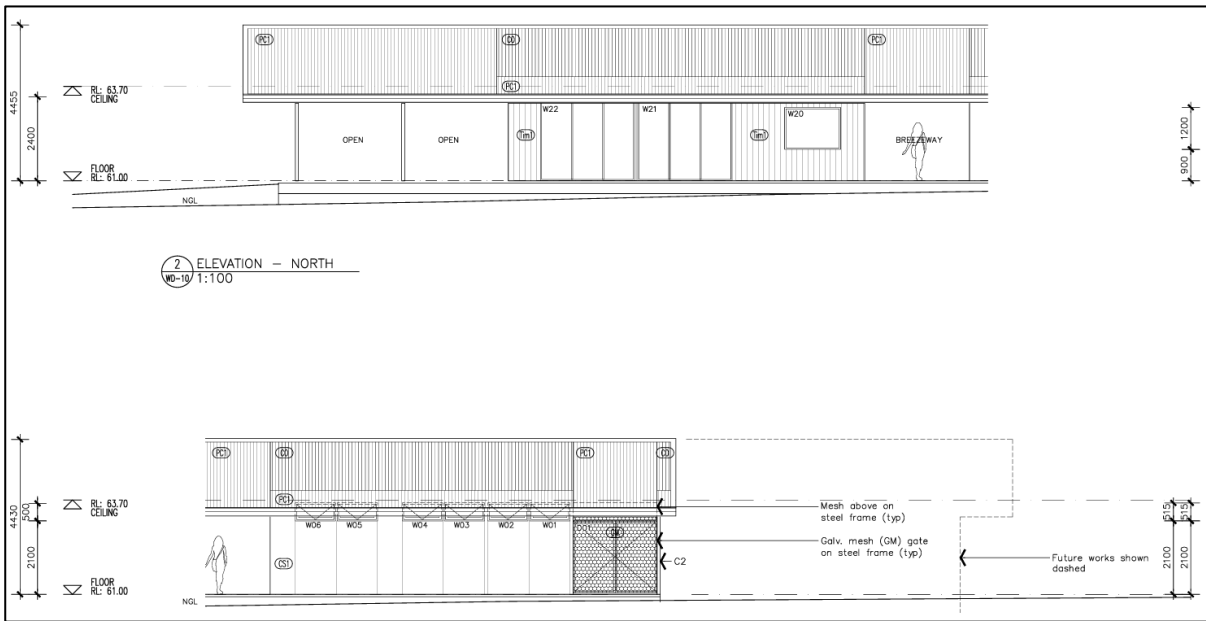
Design Drawing for new club/change rooms (Source: AKA Architects)
